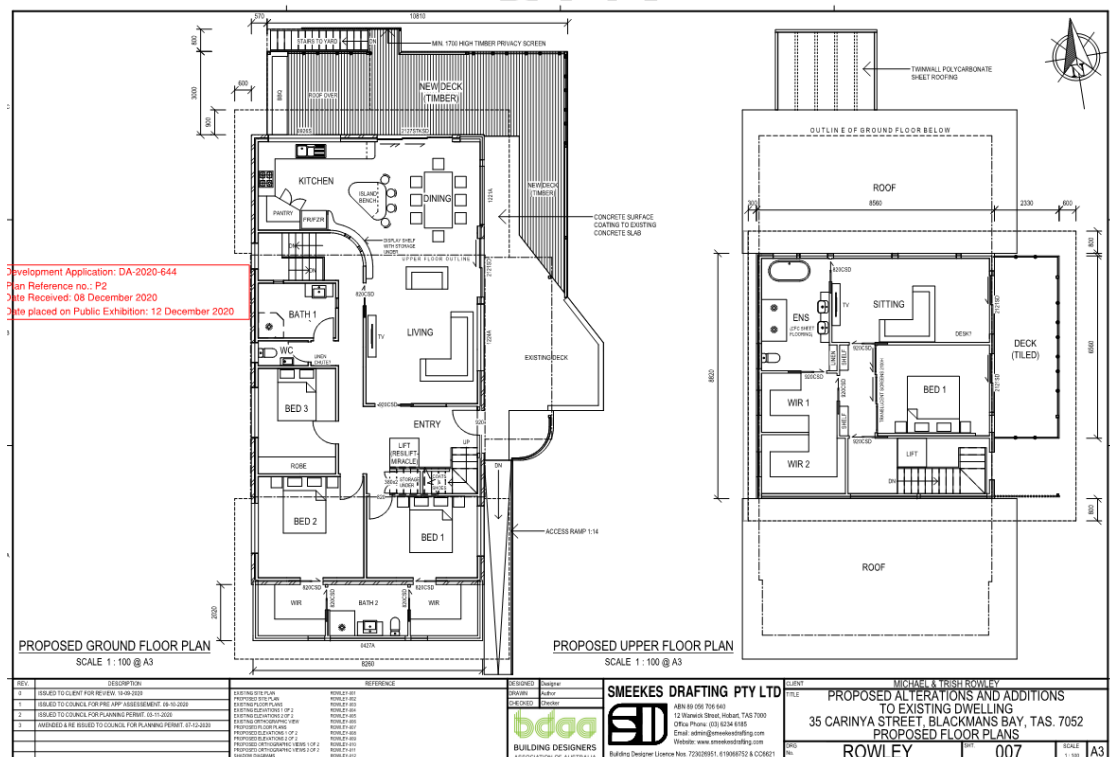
Floor plans of proposed alterations and additions (as advertised)
